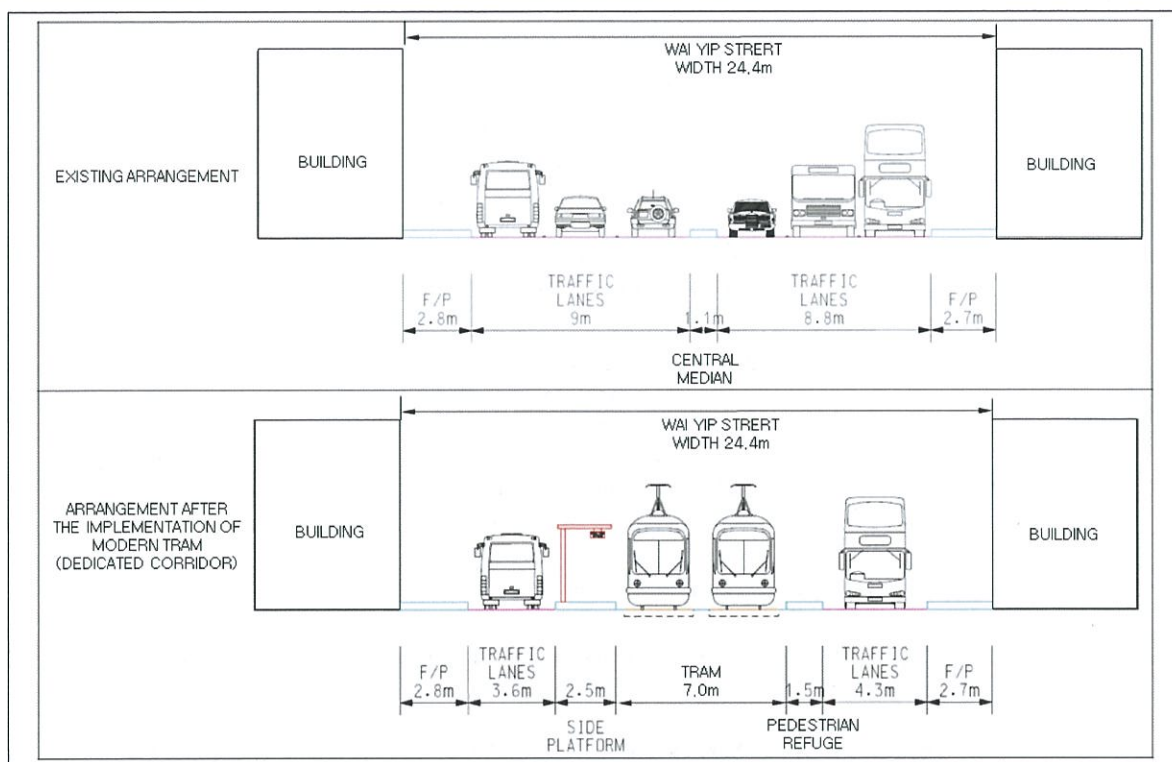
Typical Cross Section Plan of for Option 1 (At-Grade Dedicated Corridor) on Wai Yip Street (Before and After Implementation)
